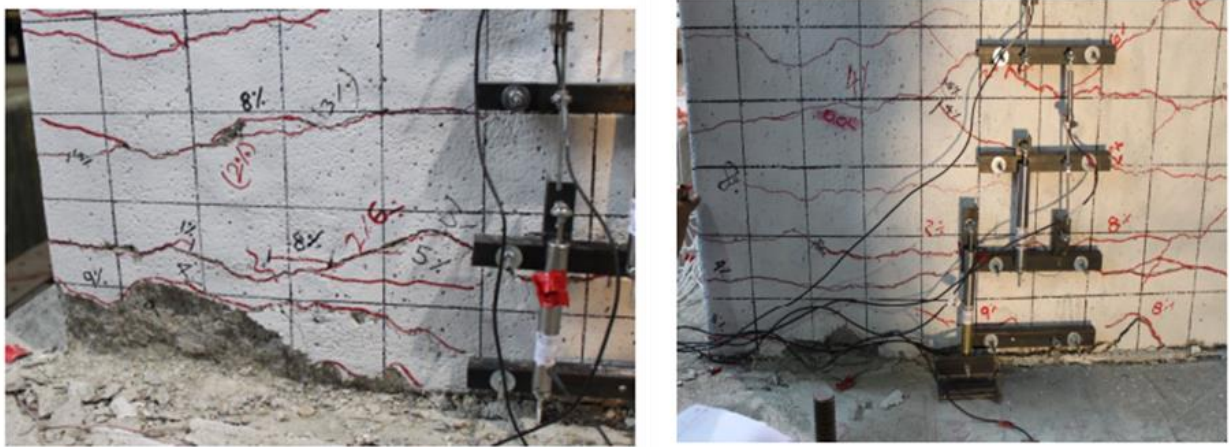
Damage state at 9% drift ratio showing cracks and spalling: (a) east face, (b) west face
